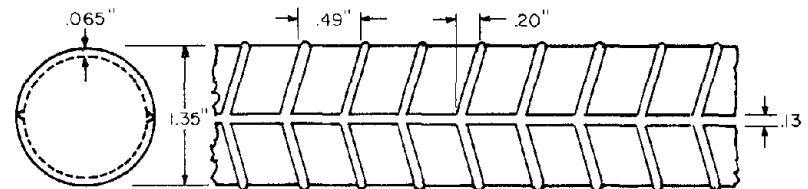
Typical Deformed Pattern of Embedded Reinforcing Bar
